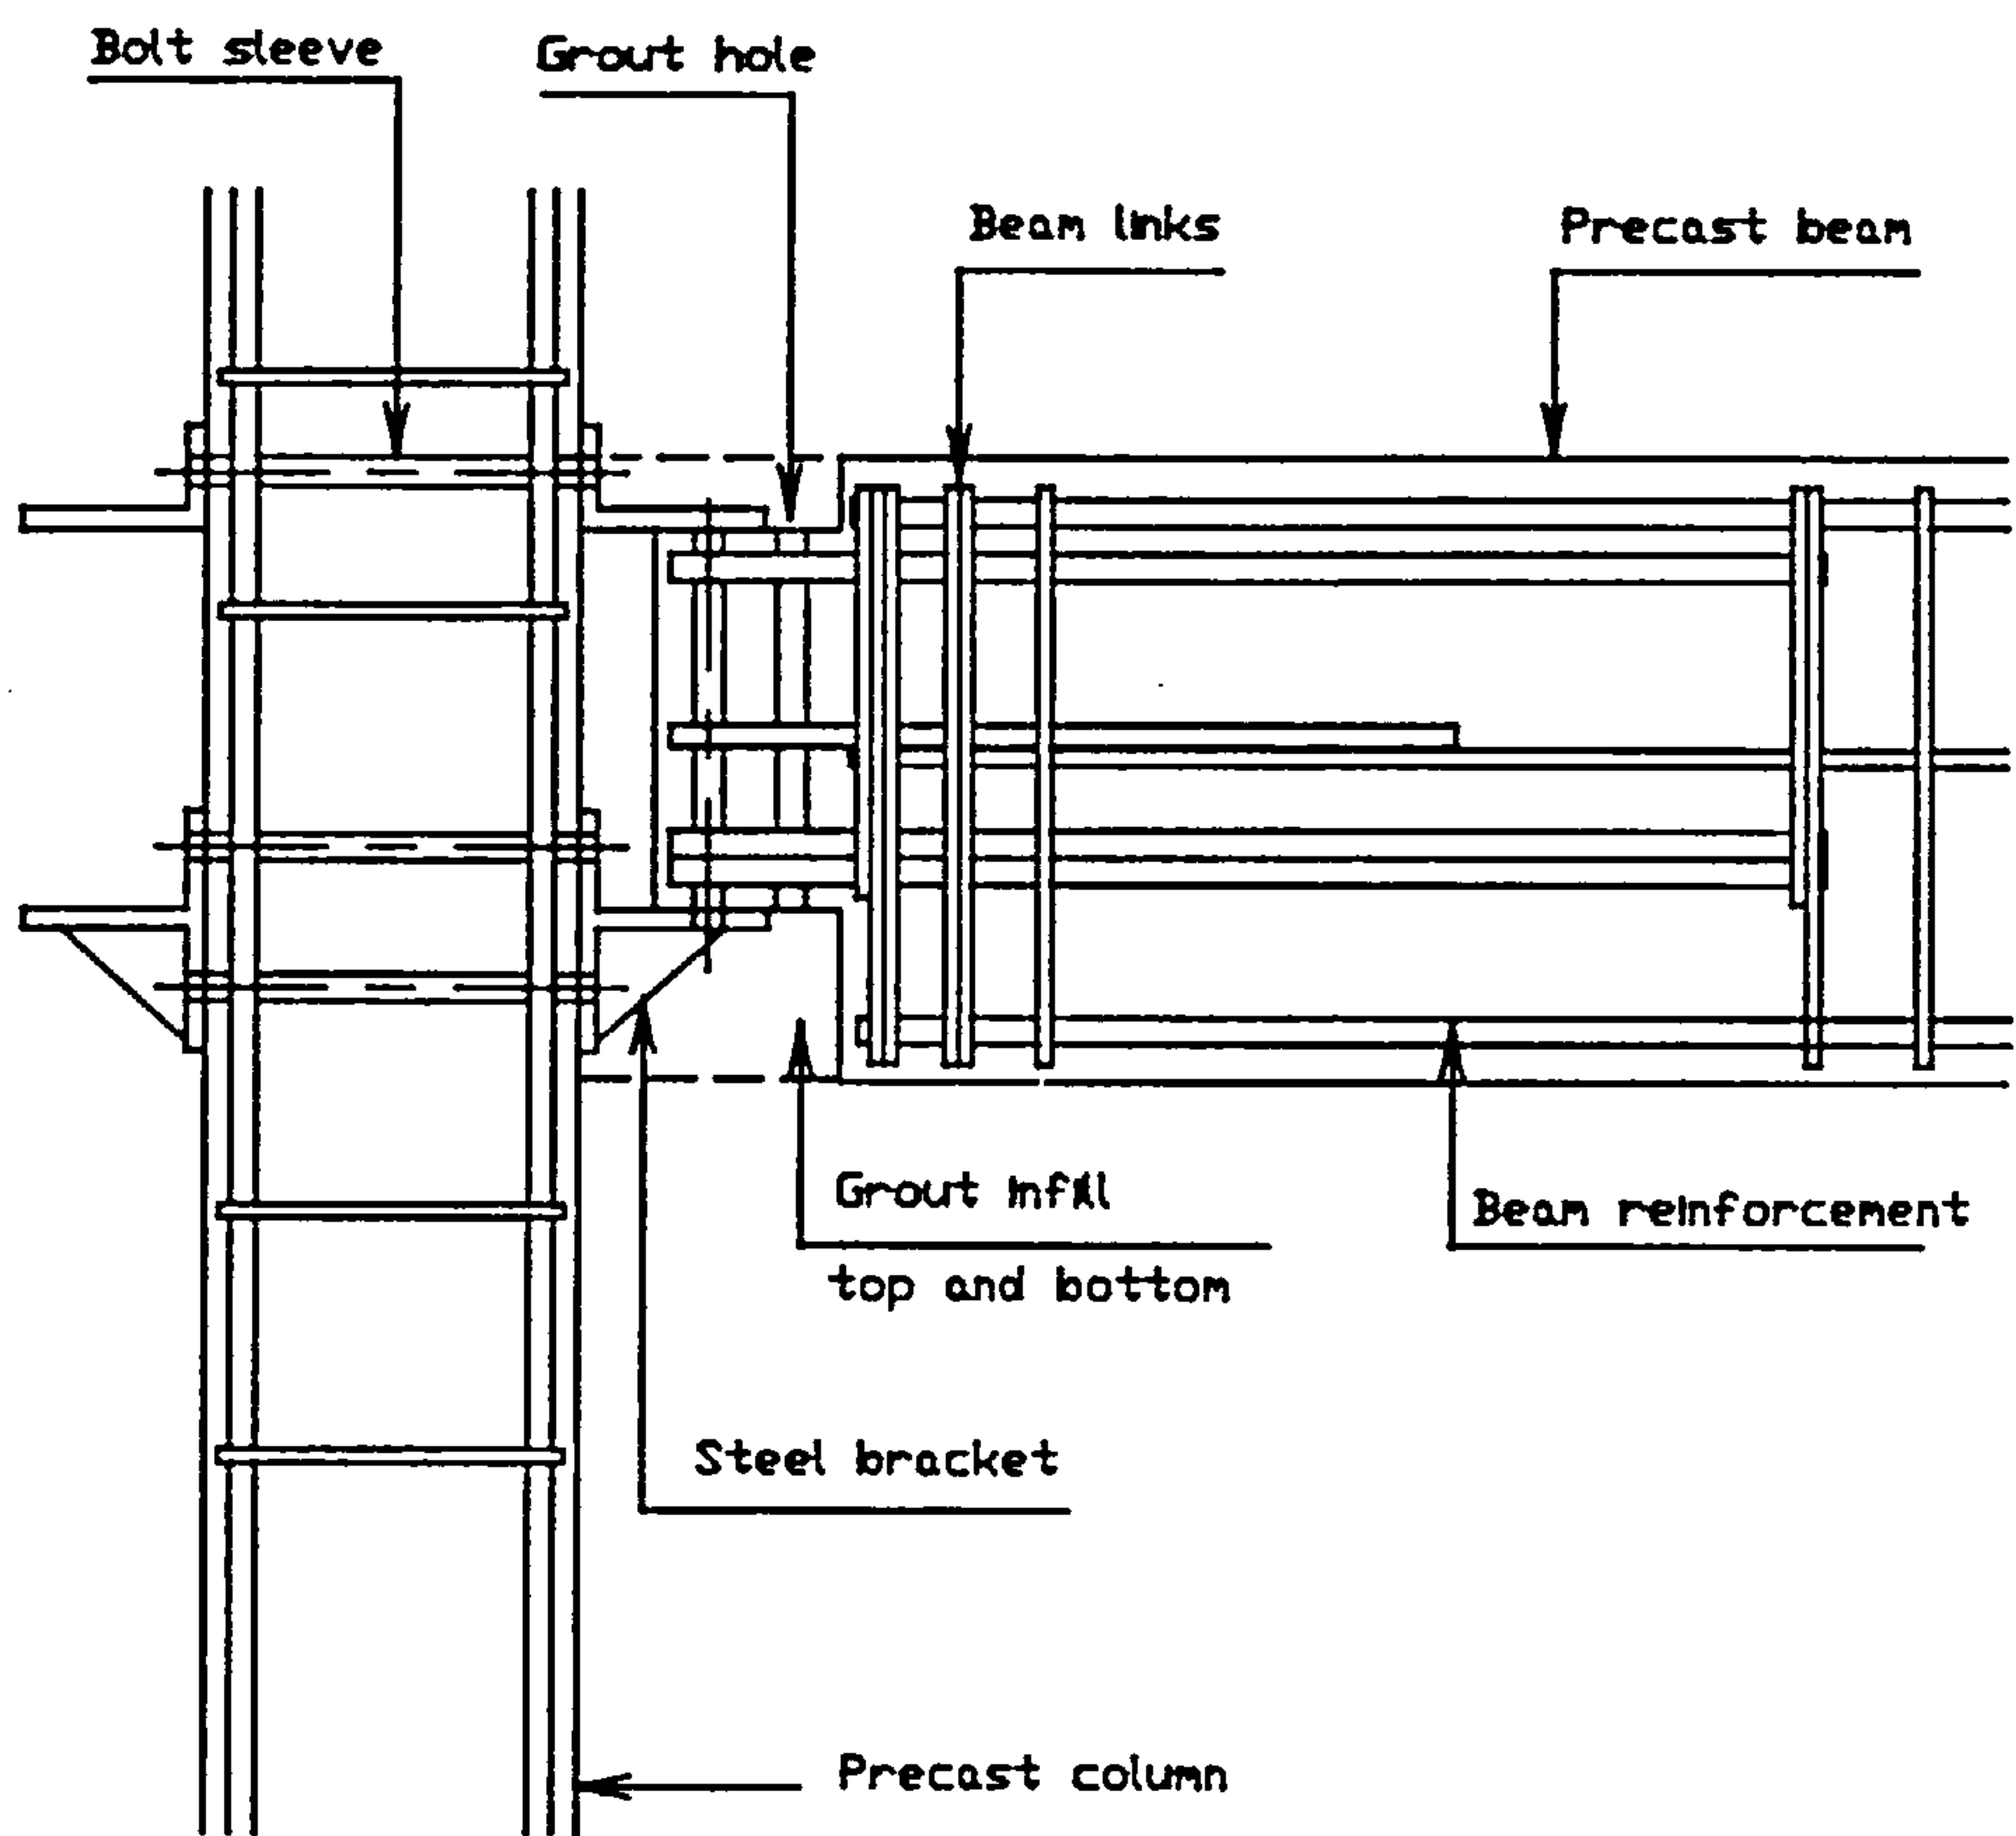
STANDARD DETAILS OF A SLEEVED BOLTS CONNECTION.
